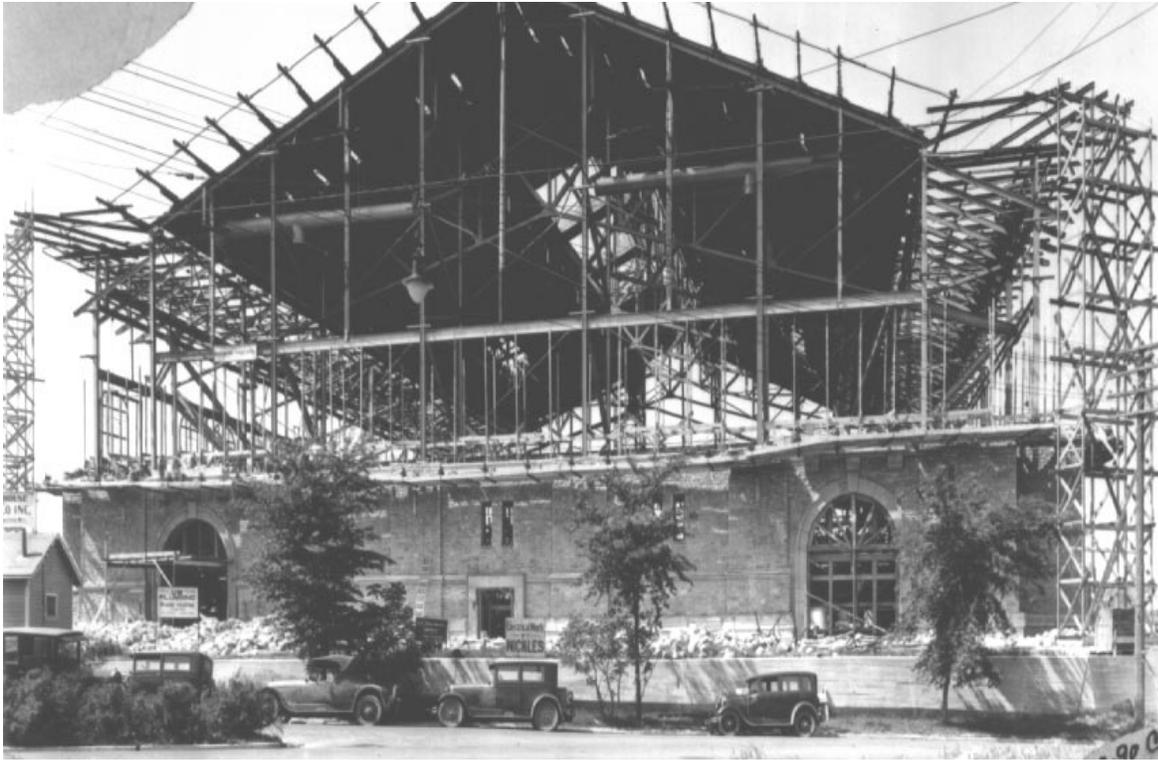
1929: the field house under construction from the Monroe Street side.
